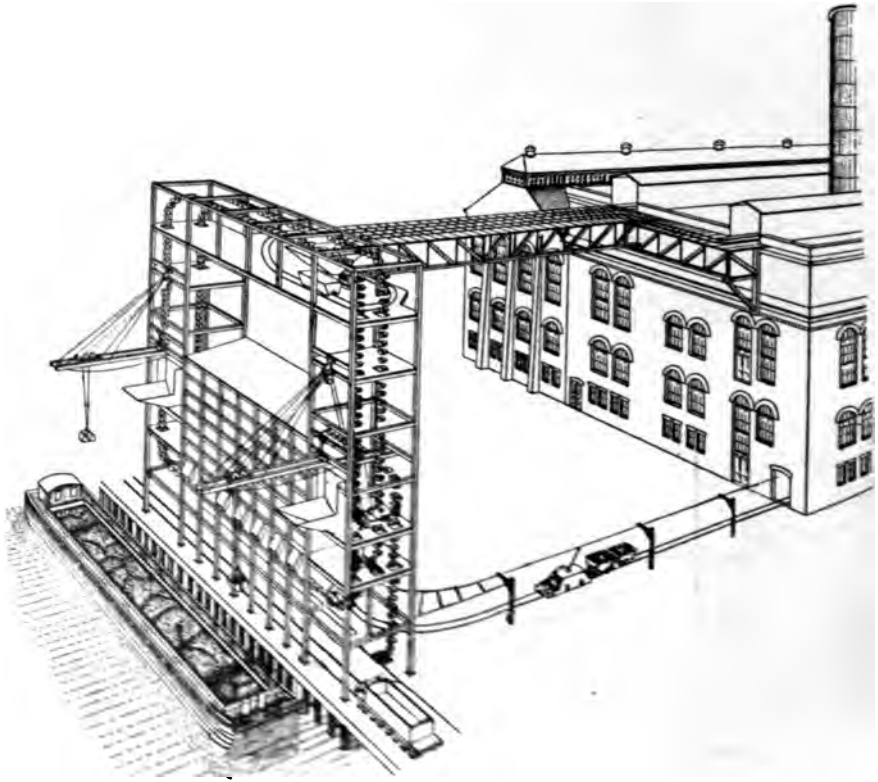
Coal handling machinery Williamsburg Power House Transit Development Co., Brooklyn, N. Y.
